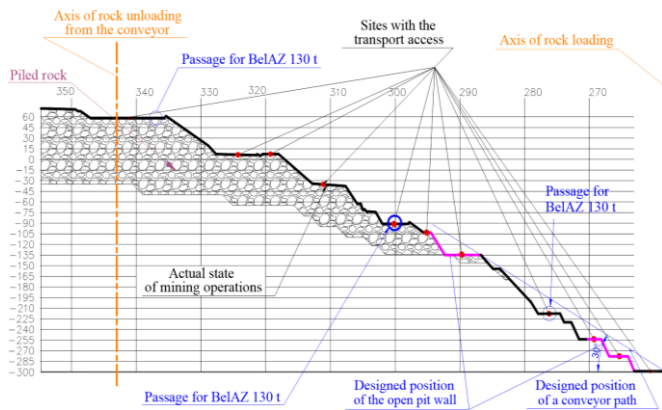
Section across the southern wall of open pit #1 (axial conveyor section)
